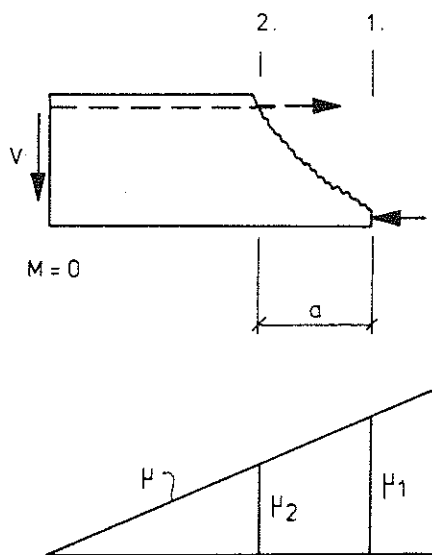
Portion of beam bounded by point of zero moment and an inclined shear crack.
